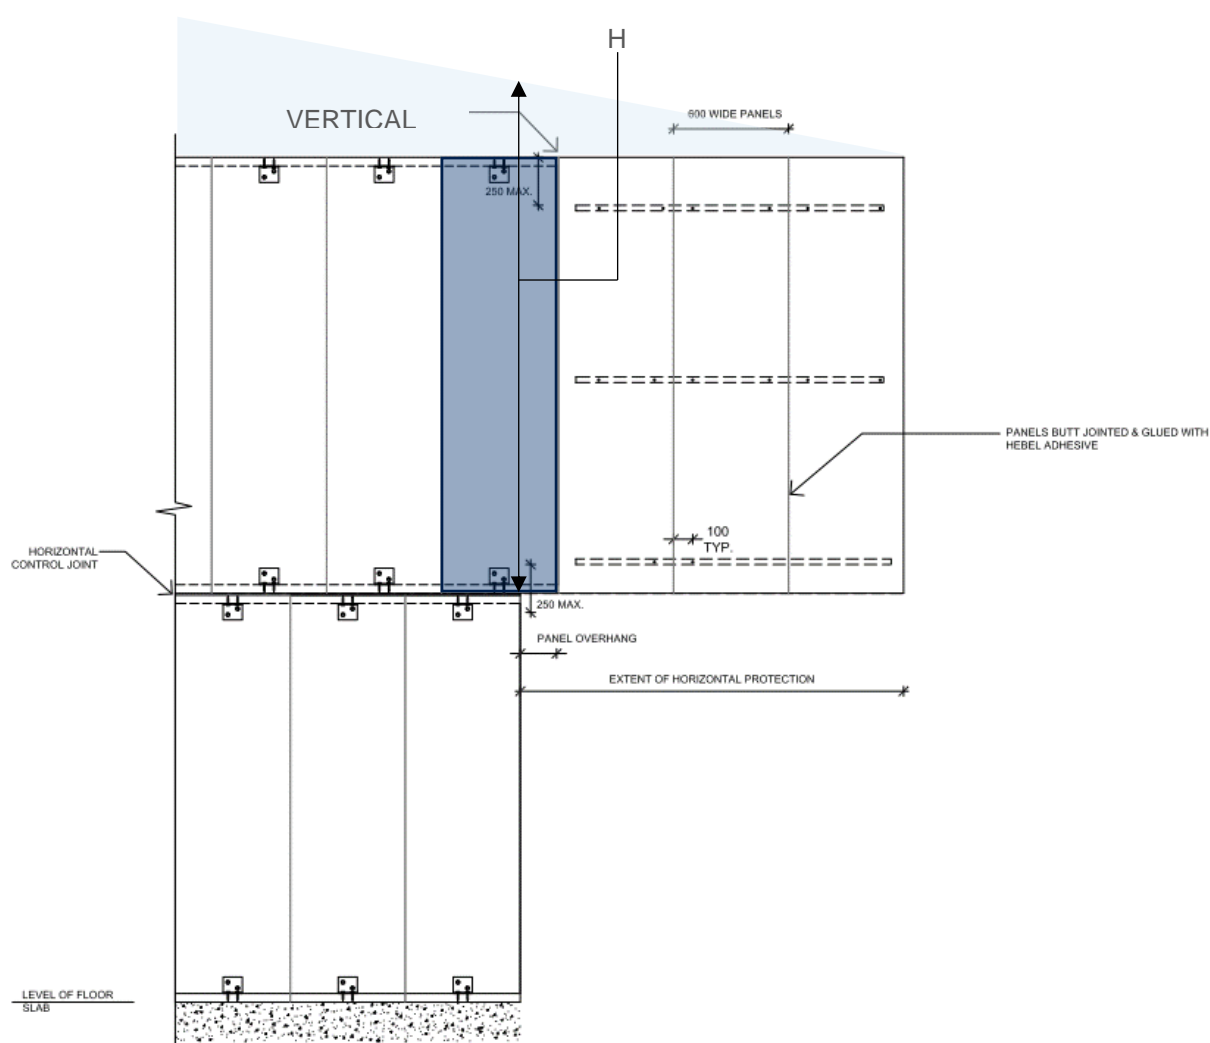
Overhang in Hebel panel (in discontinuous wall) adjacent to cantilevered partywall (non-discontinuous wall)
